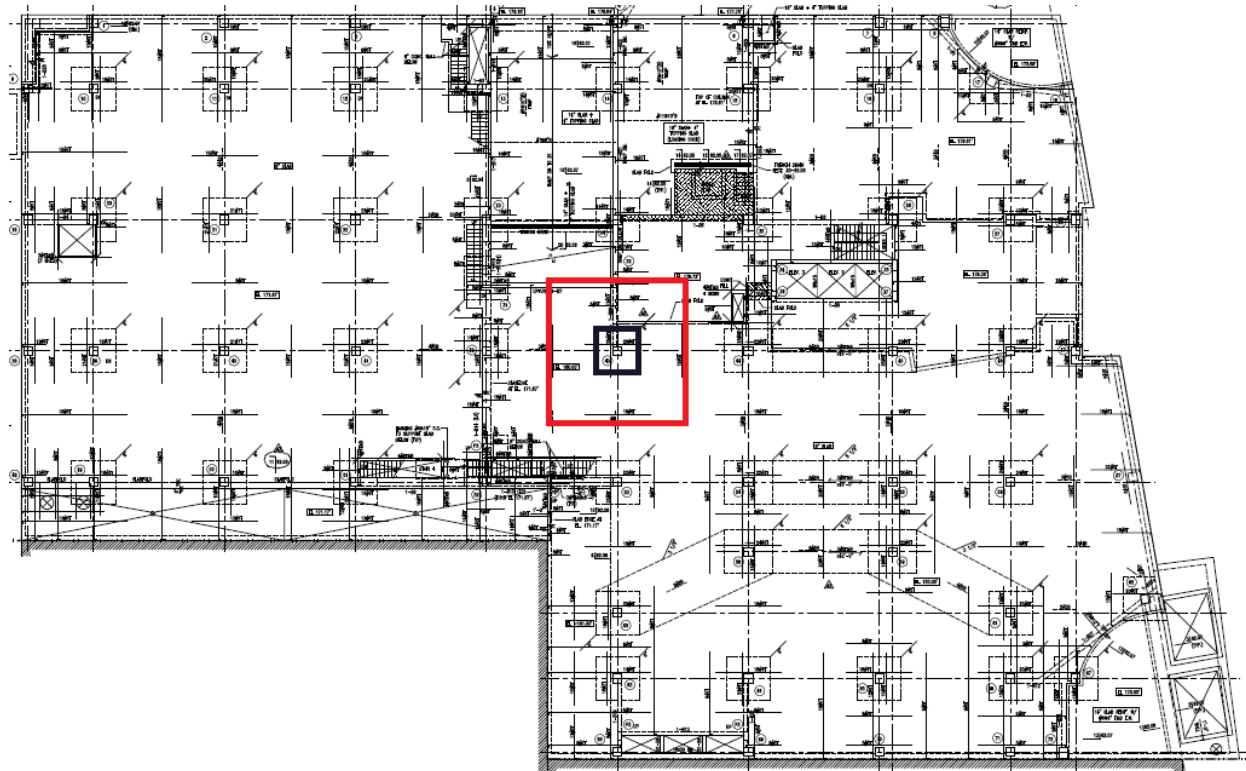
First Floor Framing Plan - column d-6 is called out as well as the tributary area
